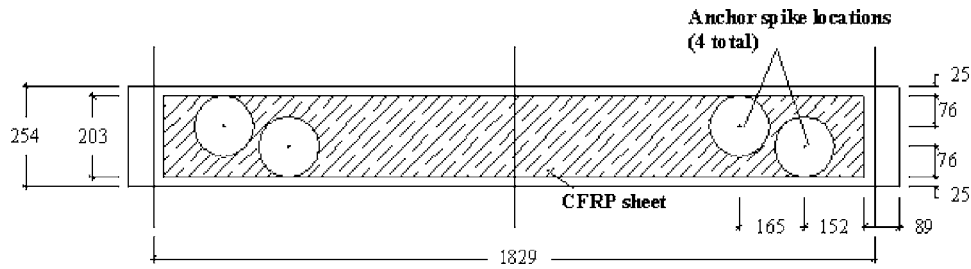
Test plan for anchor spikes placement on beam (mm)
